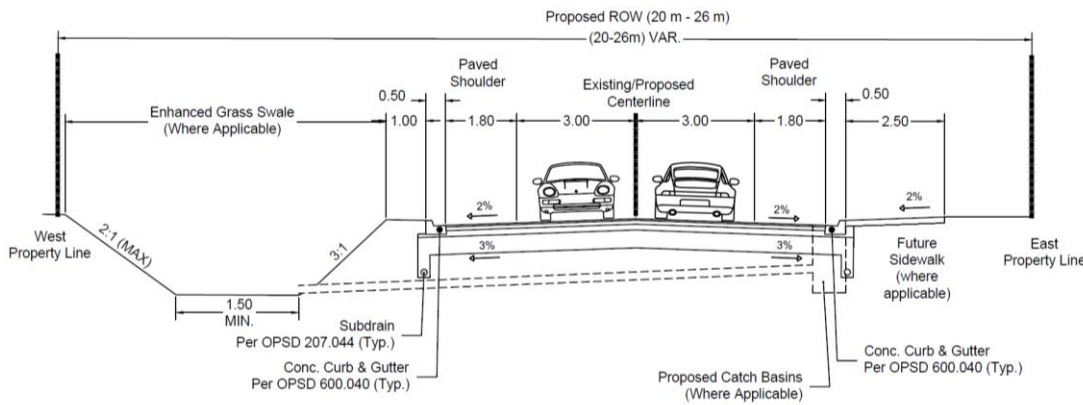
Typical Cross Section (Urban with Enhanced Grass Swale)
